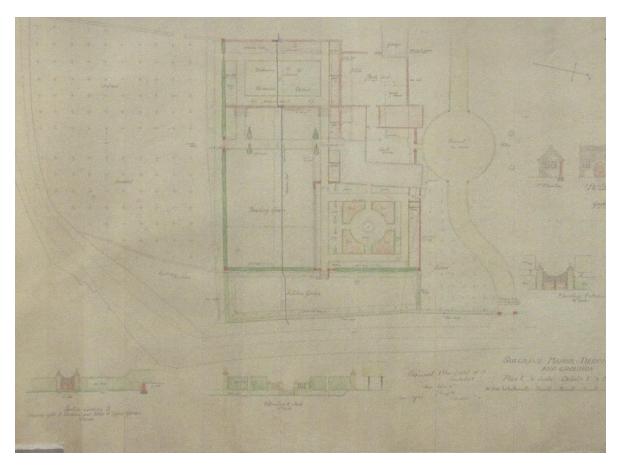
A 1920 plan showing more detail. Sulgrave Manor & Garden.
